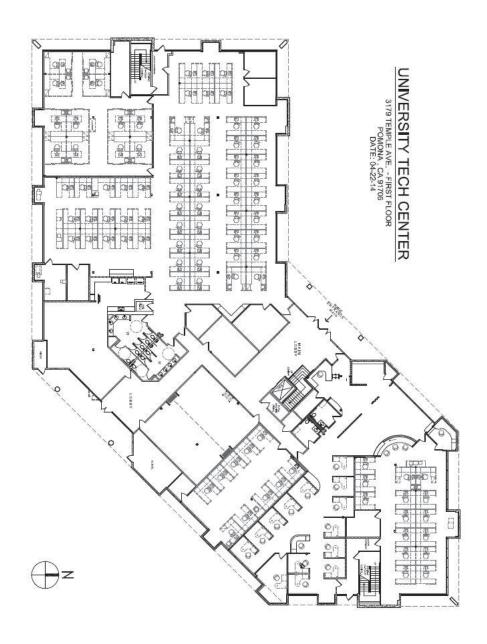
EXHIBIT AFLOOR PLAN OF PREMISES – FLOOR 2
